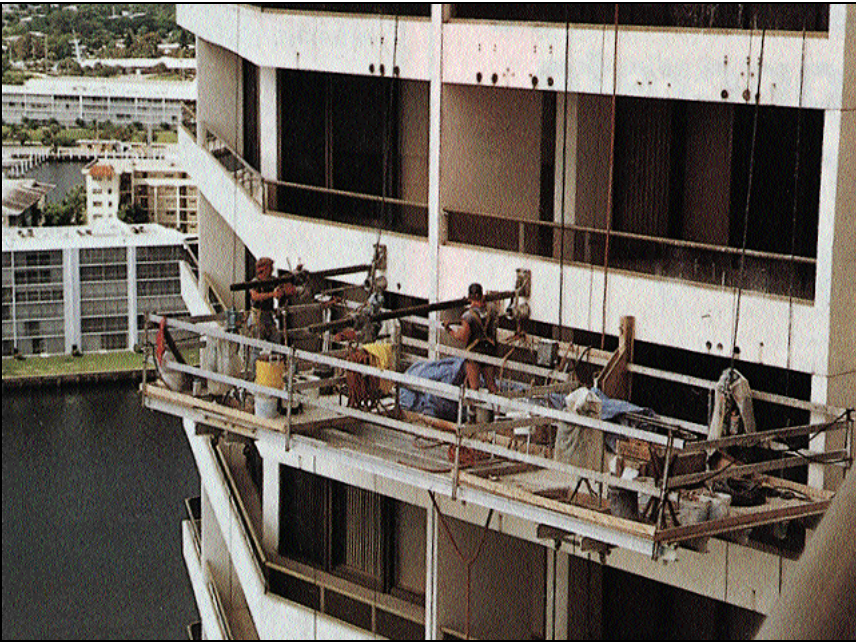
The working platform is big enough for two workers to drill 16- to 19-foot-deep holes into the balconies for adding reinforcement.
